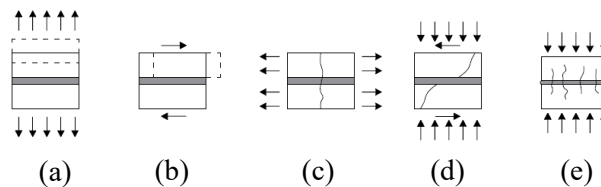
Masonry failure mechanisms: a) joint debonding, b) sliding along joints, c) unit direct tension cracking, d) shear-compression cracking of unit and e) crushing
